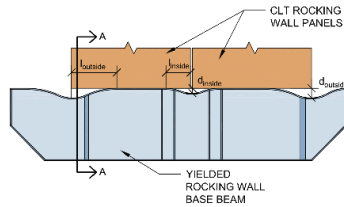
Full-scale 2-story structure Steel base beam after yielding [8]
